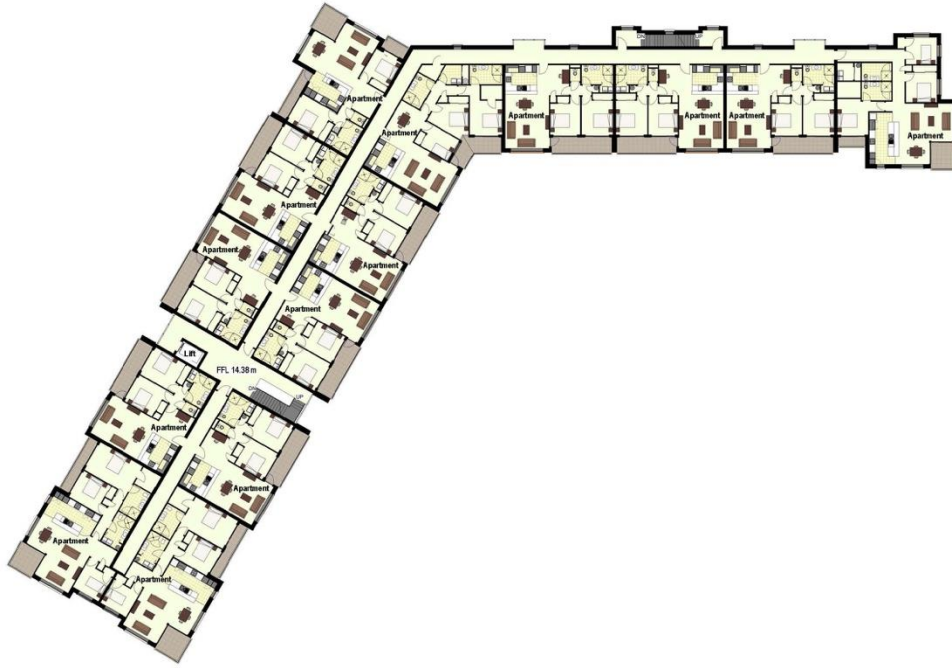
The Level 2 floor plan of Building B05 (Ryman Drawing A1-020 RC25).
